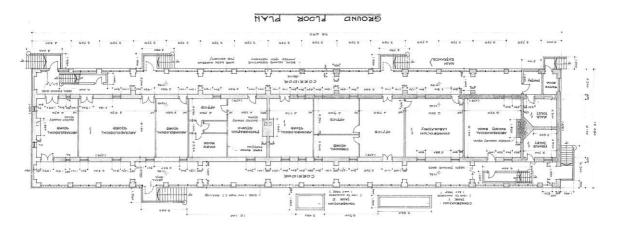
1986 Existing G/F Plan, extracted from Architectural Proposed Plan for Kowloon park 1986, Drawing No. ASM/5702. (Source: ArchSD)
